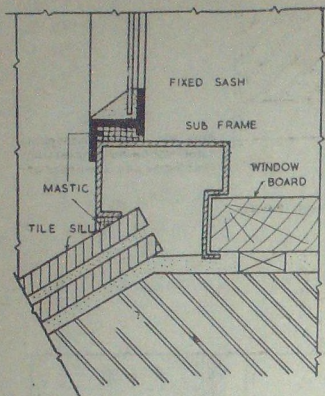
Section through a steel window showing metallic subframe and tiled sill.
